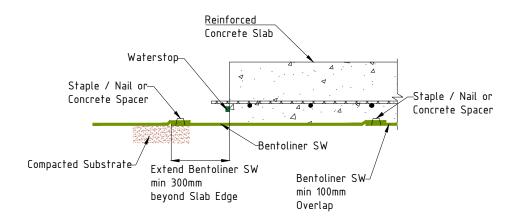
Extend BentoLiner® SW a minimum 300 mm beyond slab edge. Install Waterbar in joint, secure overlaps
